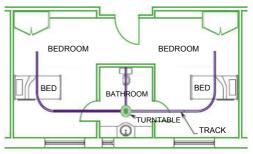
B - Alternate sample floor plan showing basic components of a ceiling hoist system.
